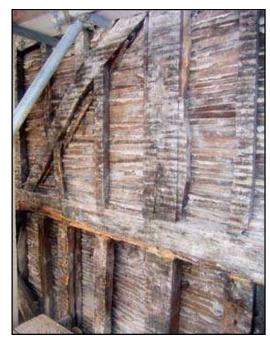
Timber framing on east elevation of No. 7 Brewer Street
